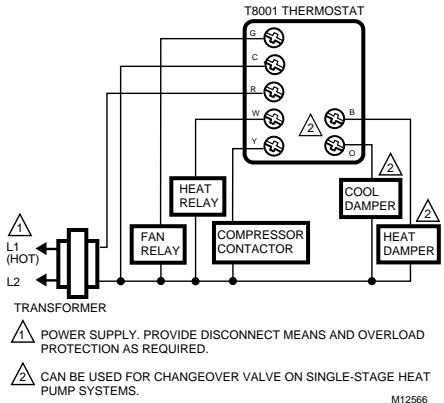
Typical hookup of T8001 in heat-cool system with one transformer.
